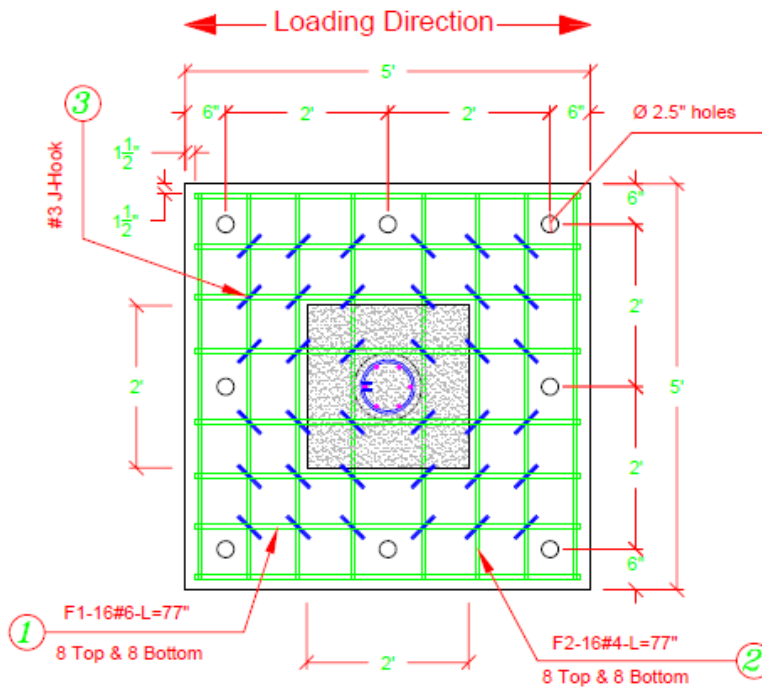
Reinforcement detailing in Plan view of specimen S1.
